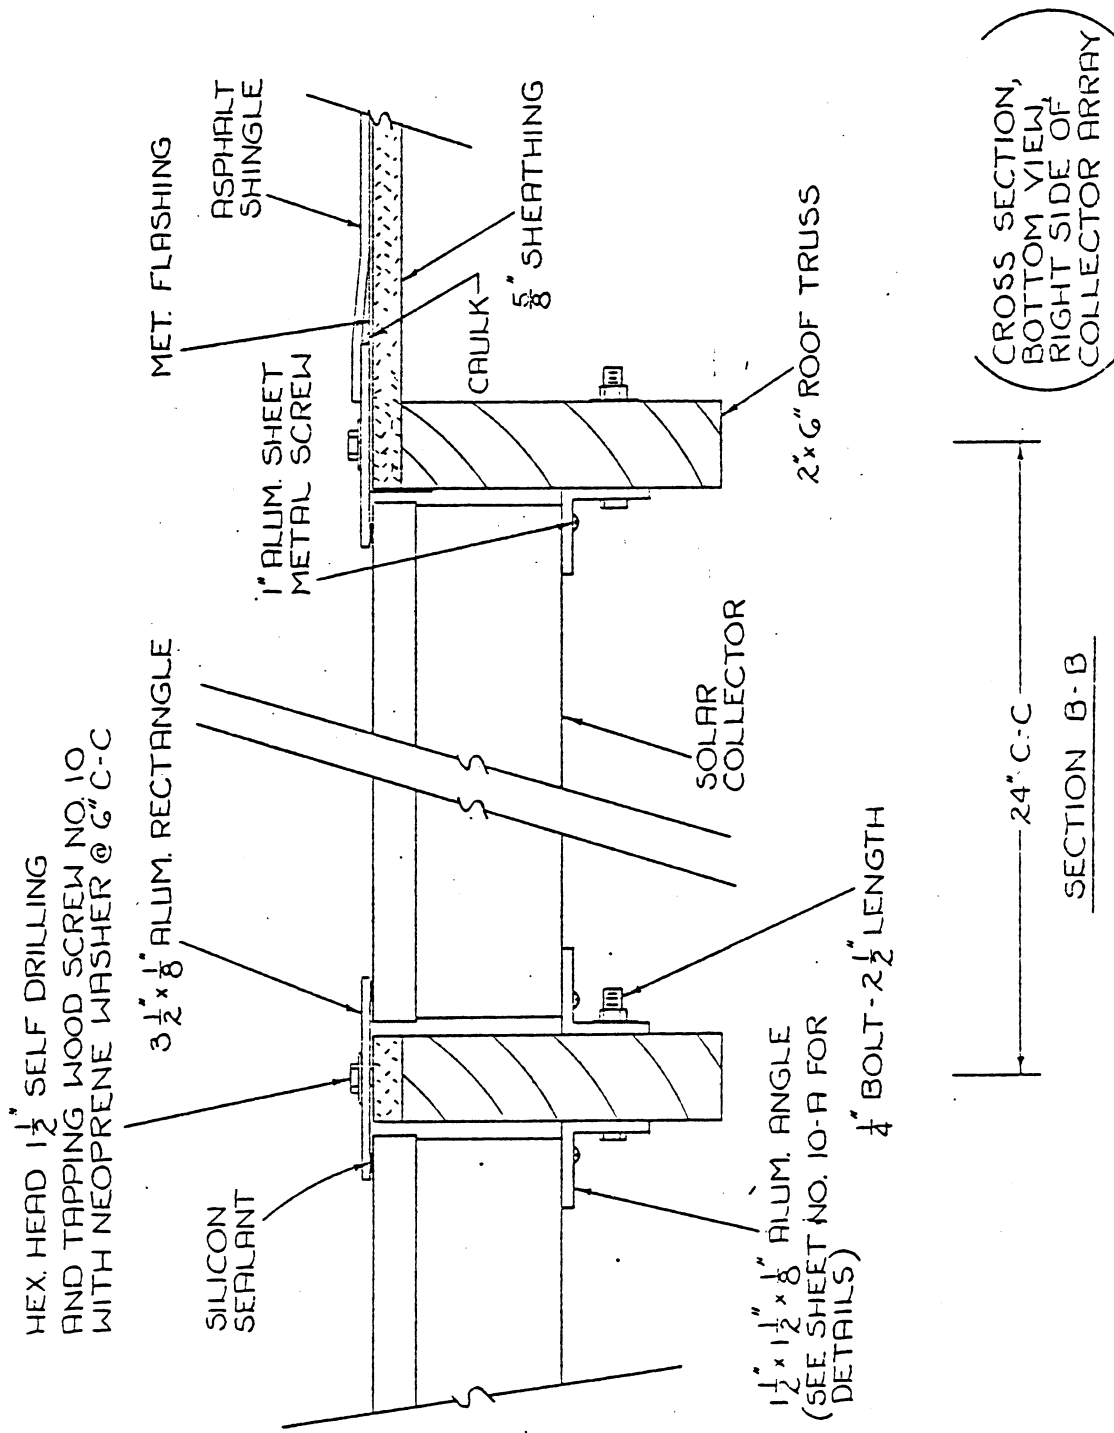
Section BB from Figure A-2 showing additional details for mounting solar collectors to roof of building.
